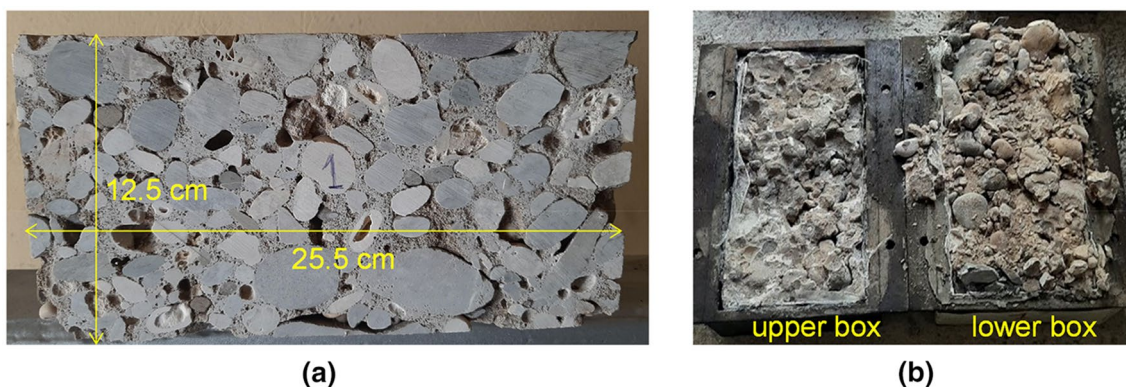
Specimen tested in the direct shear test: a Before testing; b after the failure
